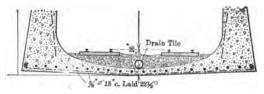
Section Tunnel (M. St. P. & S. Ste. M.).
